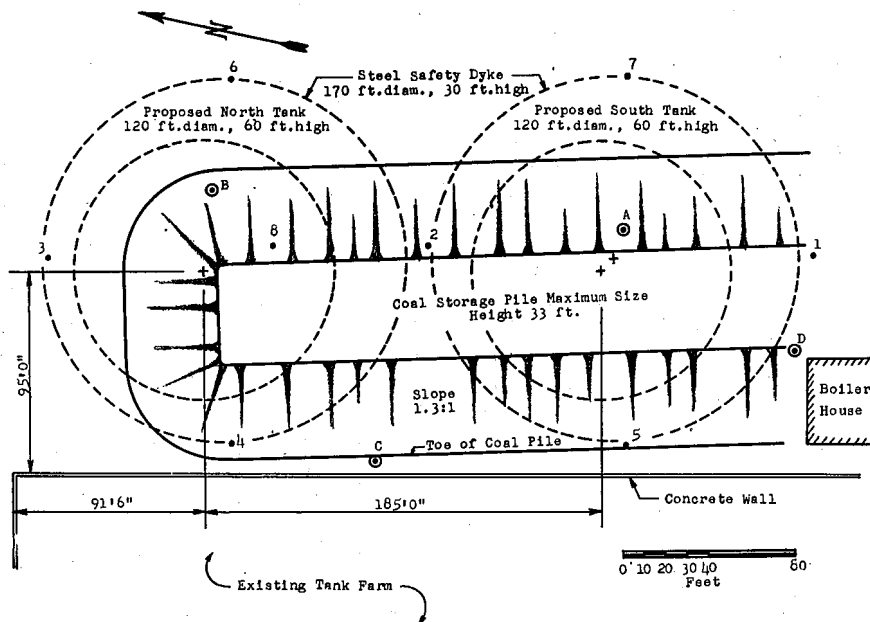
SITE PLAN SHOWING LOCATION OF BORINGS.
